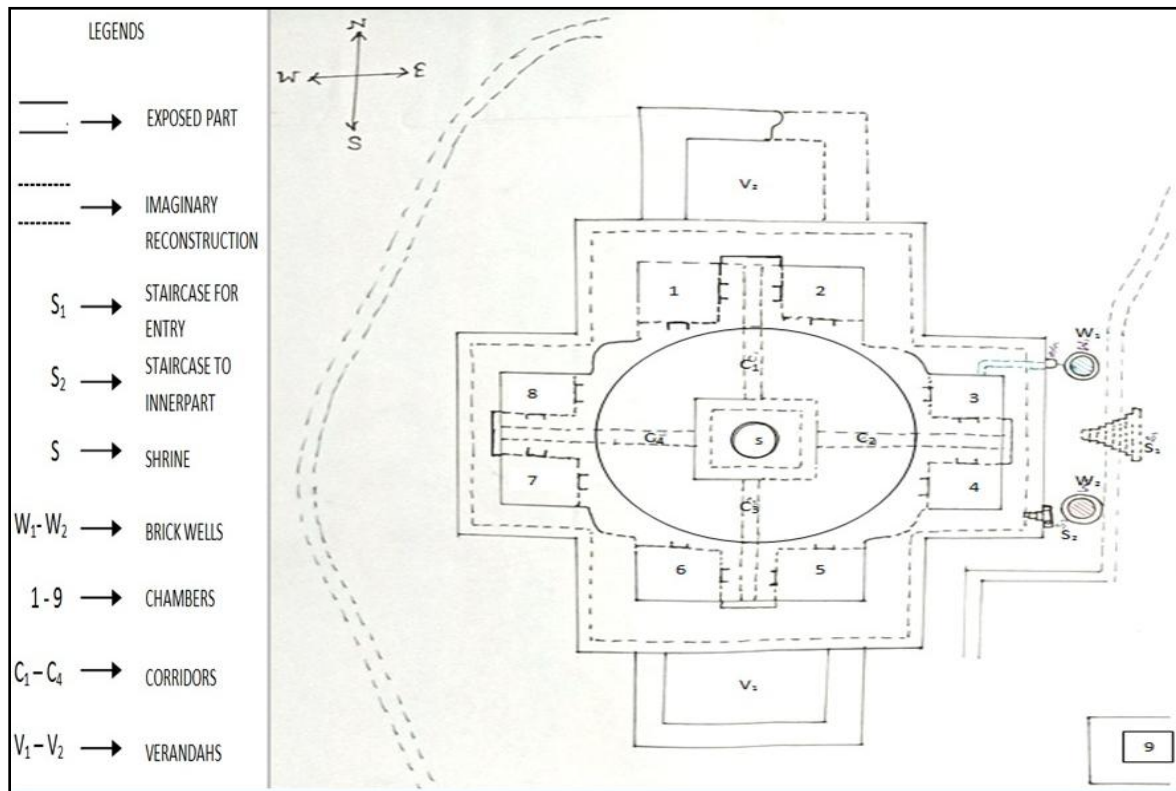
Schematic diagram of the ground plan of the site (not to scale)
